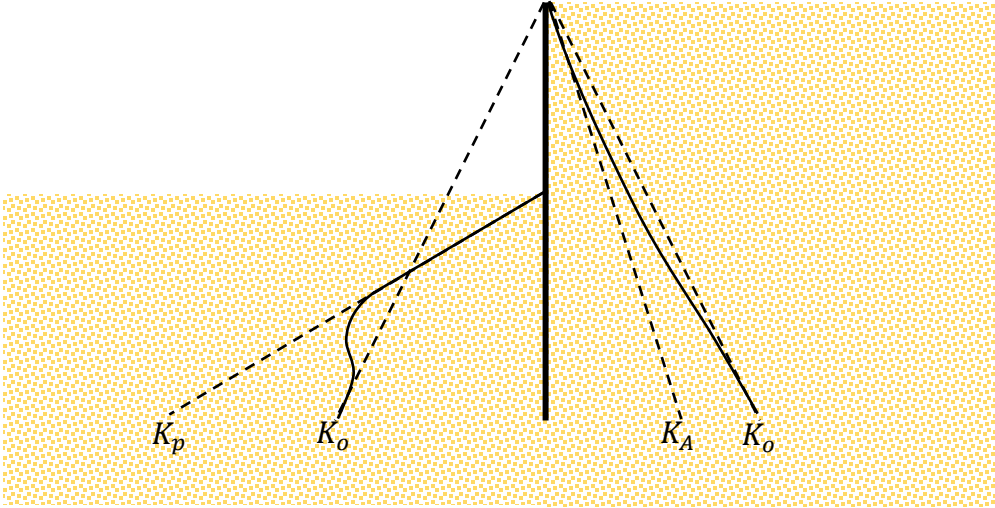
Stress distribution along a cantilever wall accounting for actual ground movements (after Atkinson 2007). flexible cantilever retaining wall that is exposed to the excavation and just below excavation, where the actual earth pressure on the excavation side of the wall is in the passive failure condition, K_p , in Figure 2.11.
